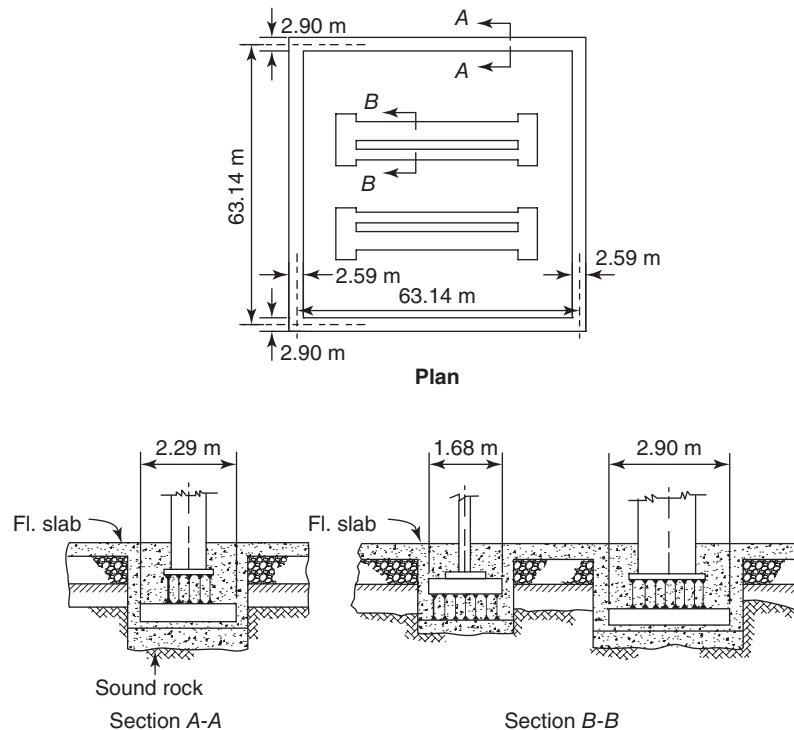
Foundation plan for the World Trade Center. (Courtesy of the Port Authority of New York and New Jersey.)
